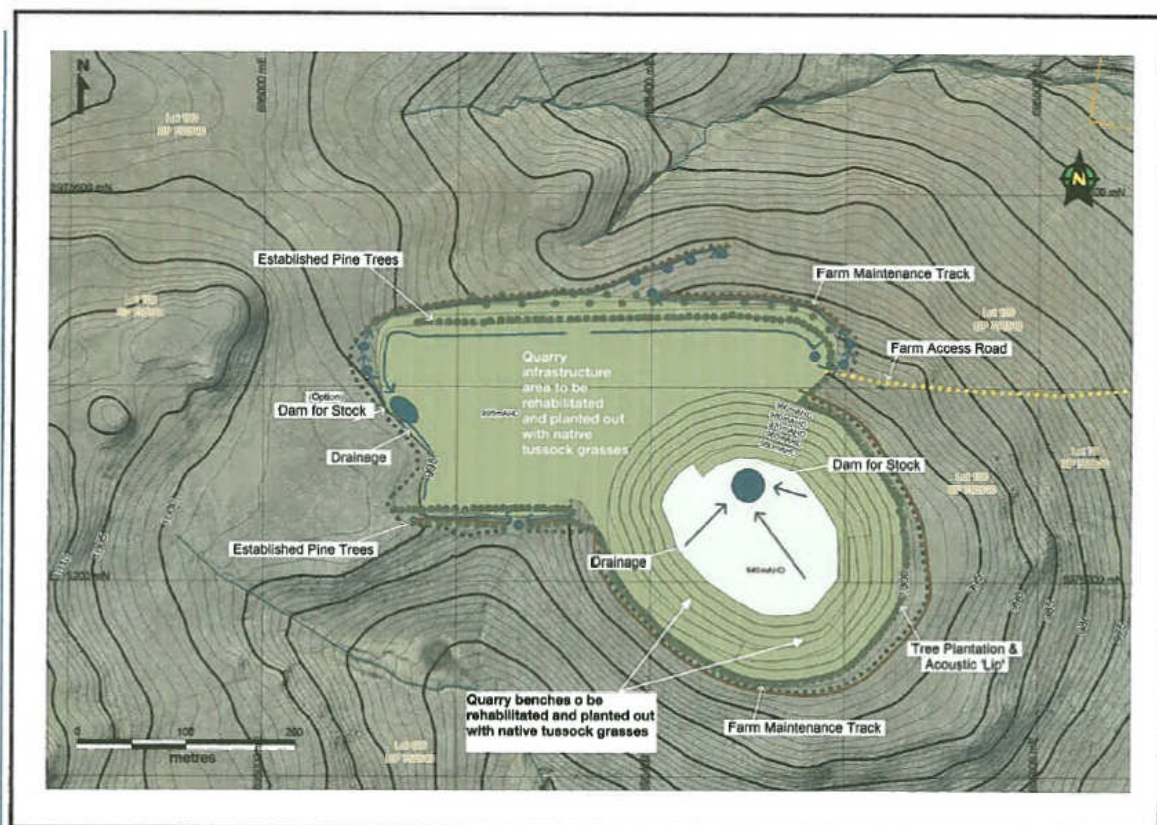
Proposed plan of site rehabilitation provided in the EIS
